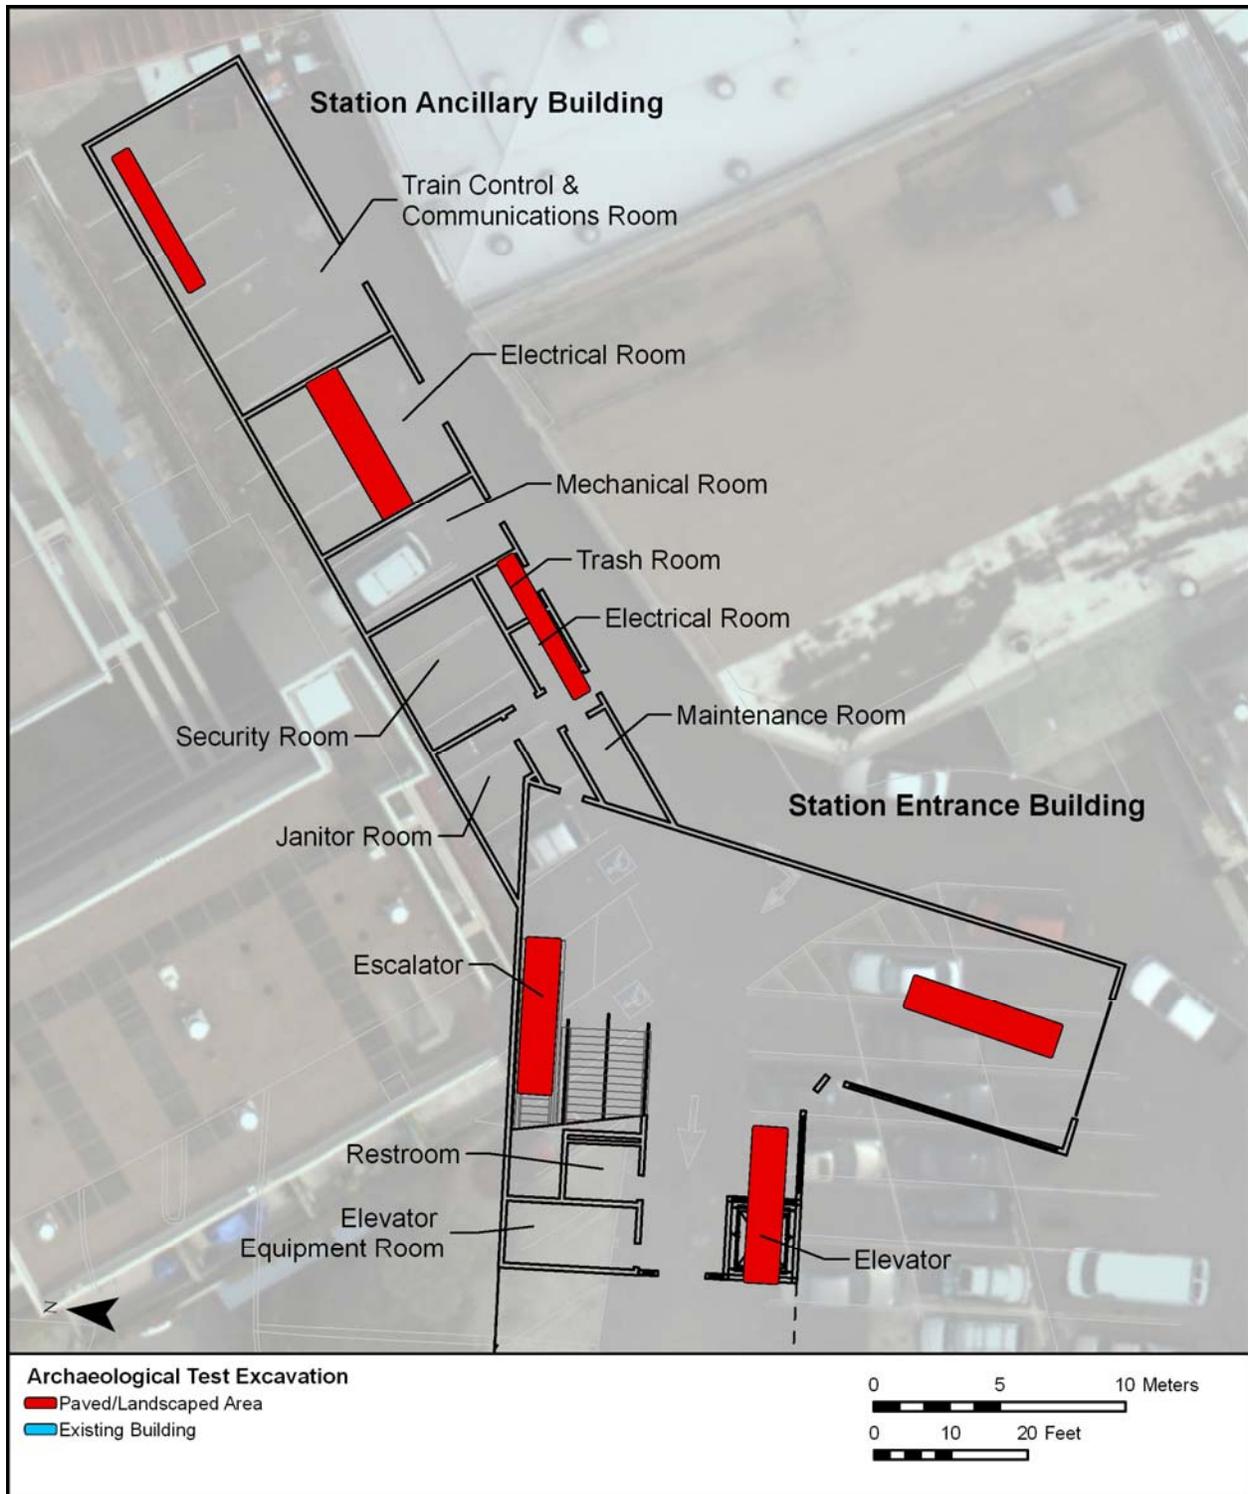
Chinatown Station detail of (*mauka*) Station Entrance Building and Station Ancillary Building layout showing proposed locations for archaeological inventory survey testing (three 4' by 20' test trenches at *mauka* Station Entrance Building and one 4' by 20' test trench and two 2' by 20' test trenches at *mauka* Station Ancillary Building)
